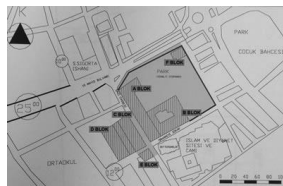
Layout Plan of Samsun Tekel Tobacco Factory Campus.
